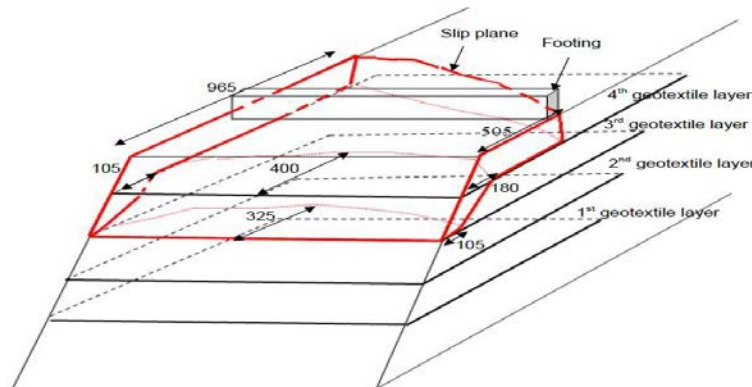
Failure plane geometry of OMC-2% outdoor model embankment (all dimensions are in mm)
